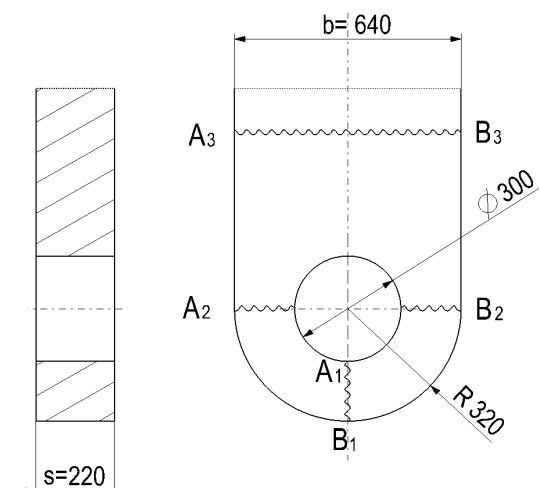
Detail around the opening at the brace with marked characteristic cross-sections.
